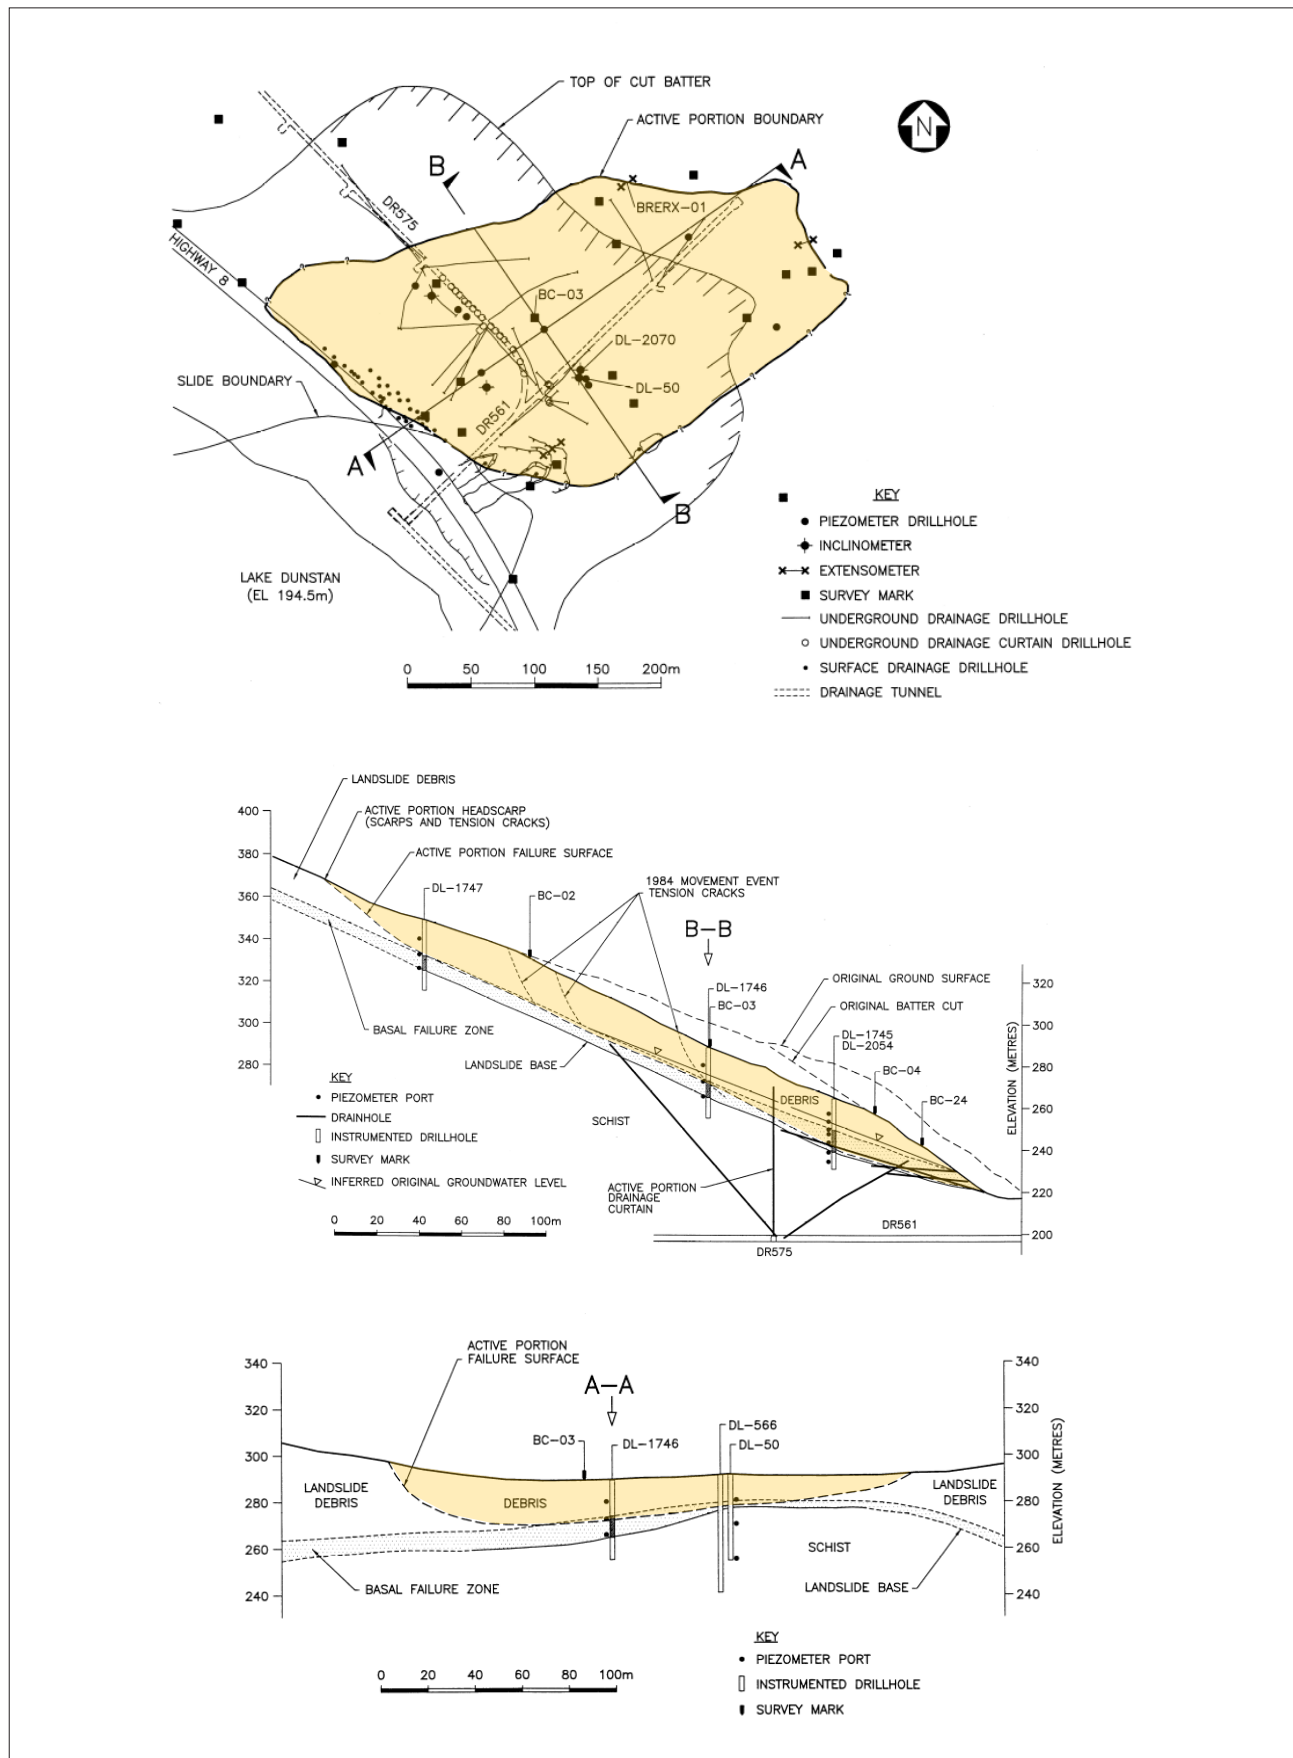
Example Geological Model outputs as a plan and interpreted sections (modified from Macfarlane et al, 1999)
